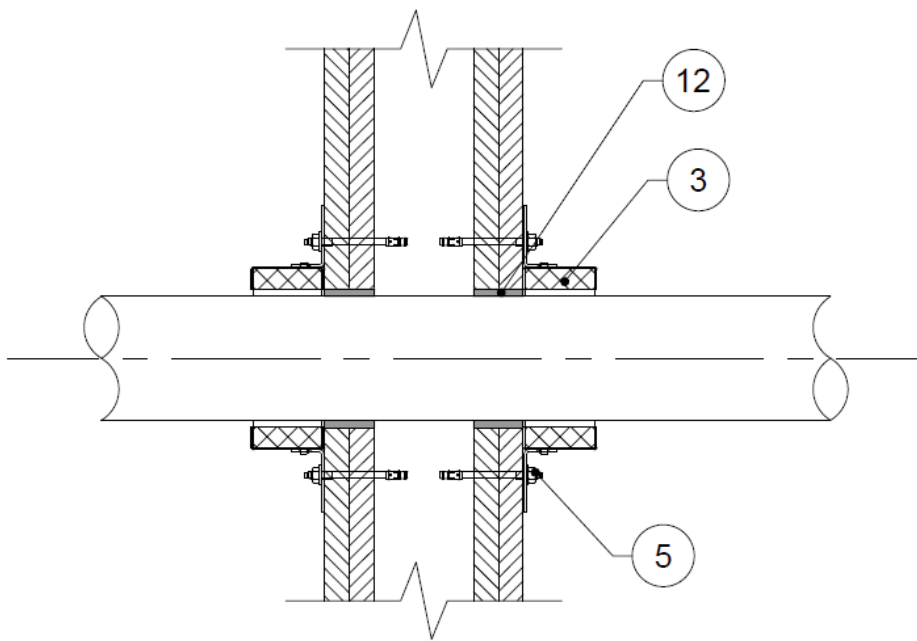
Sealant Detail around Uninsulated Pipes in Plaster board Walls
